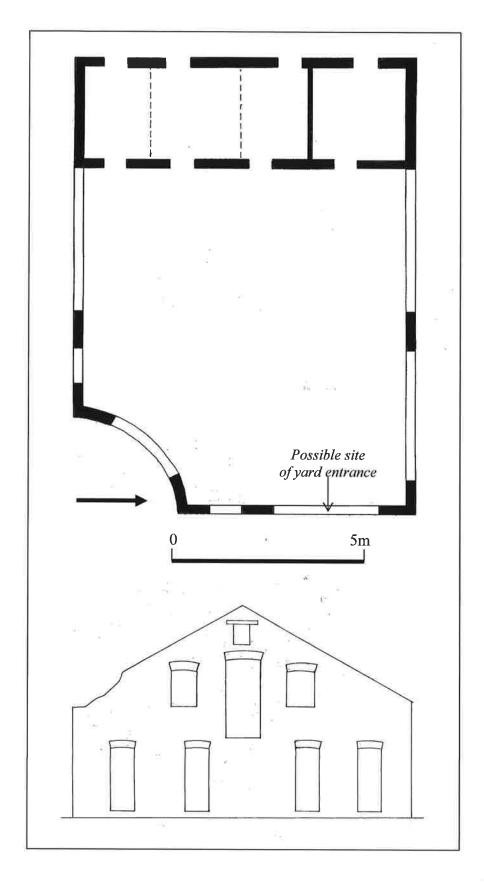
Plan (top) and west elevation of the Piggery Complex (Building G).
